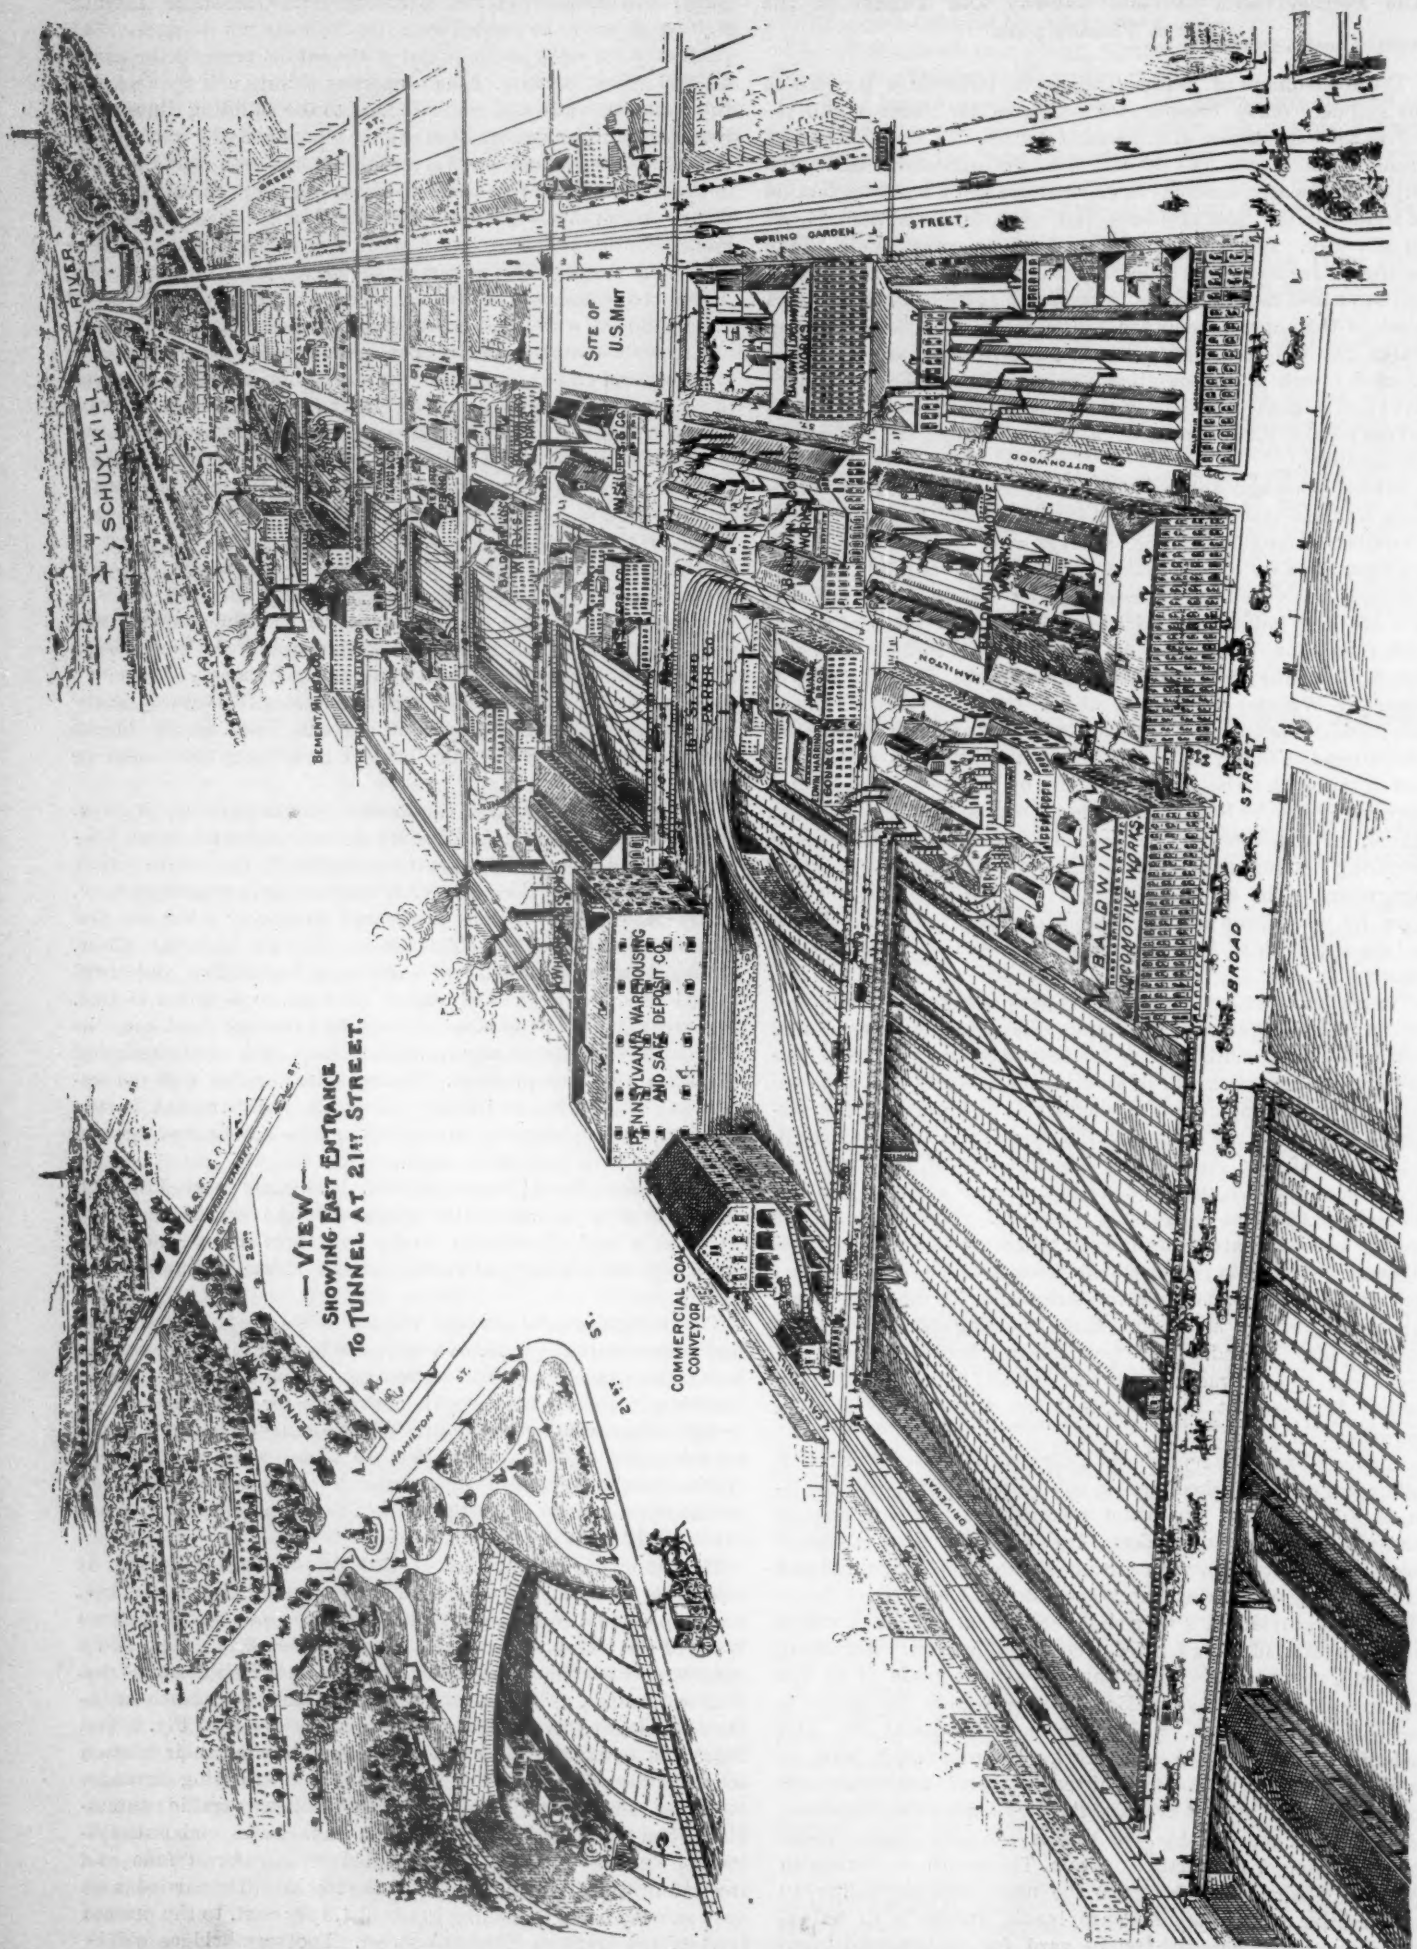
PERSPECTIVE VIEW, SHOWING PENNSYLVANIA AVENUE SUBWAY AND TUNNEL AS IT WILL APPEAR WHEN COMPLETED
